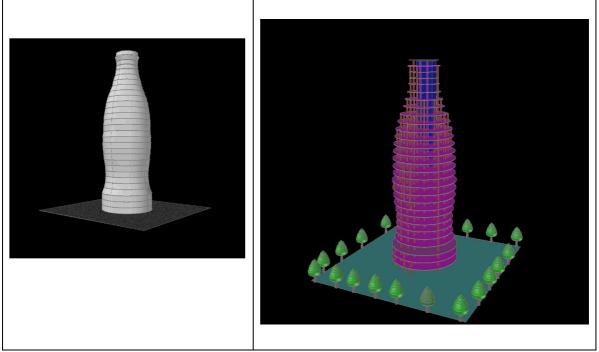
the façade of the first bottle shaped structure and the corresponding structural frame.
